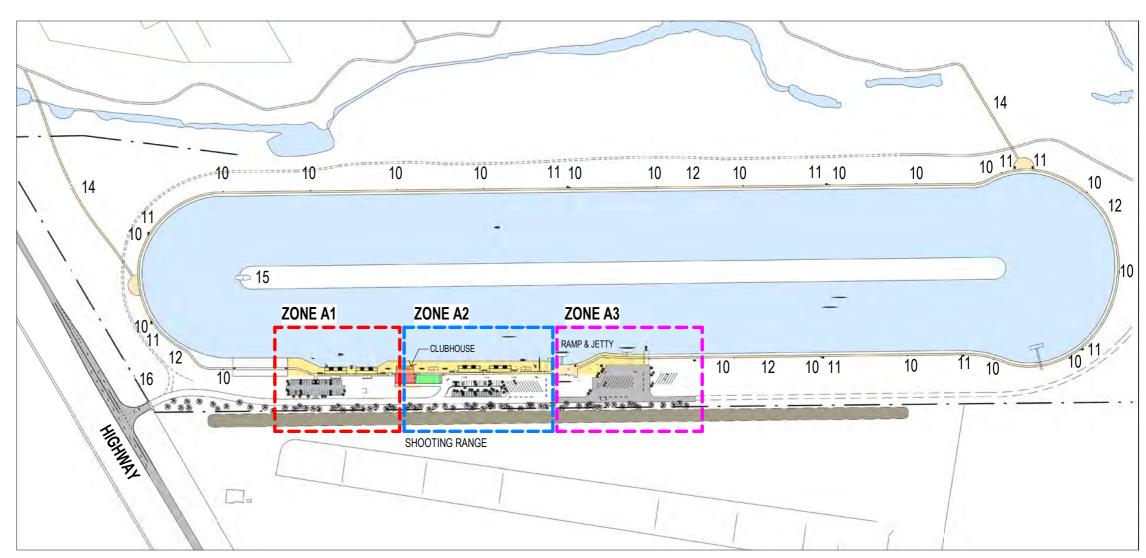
Barcaldine Recreation Park zone plan (for master plan)
